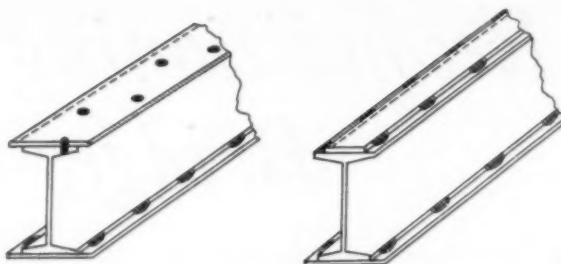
Cover Plates Welded to Flanges of Floorbeams or Stringers
